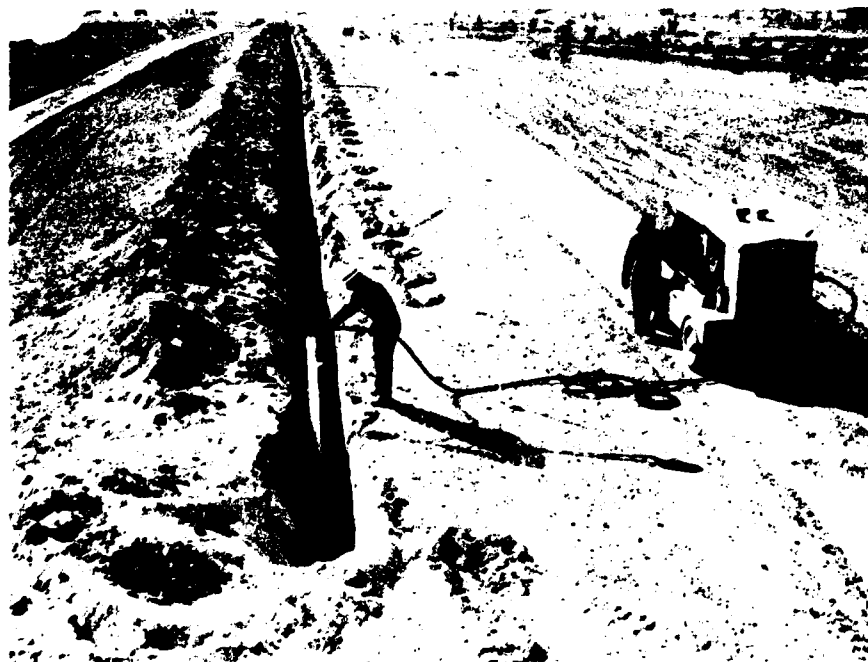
Pressure testing of 600-ft pipe prior to backfilling
